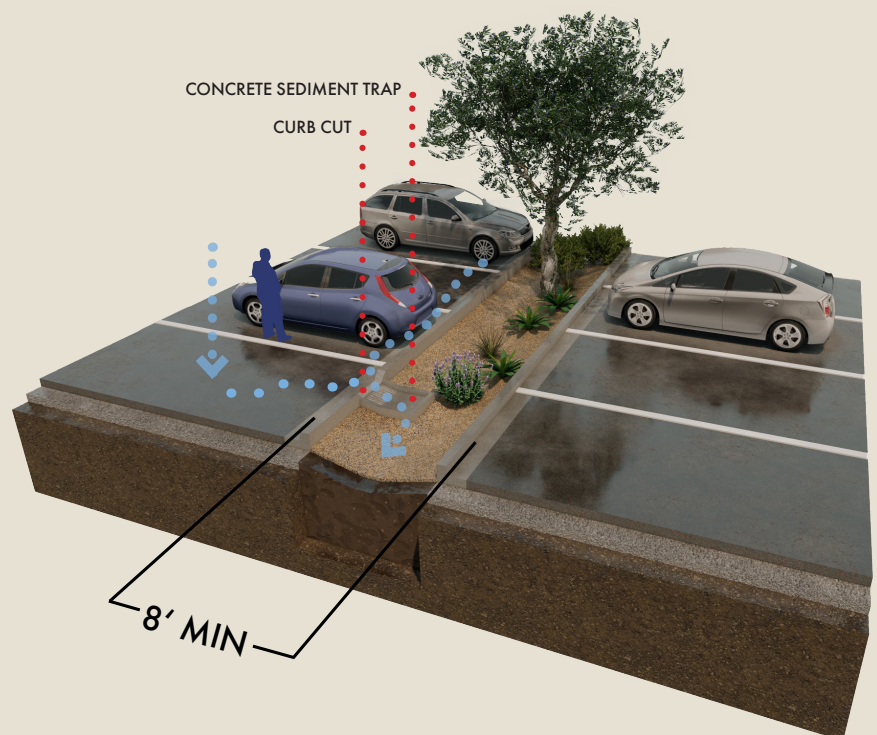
Curb openings, curb cuts, & sediment traps.
